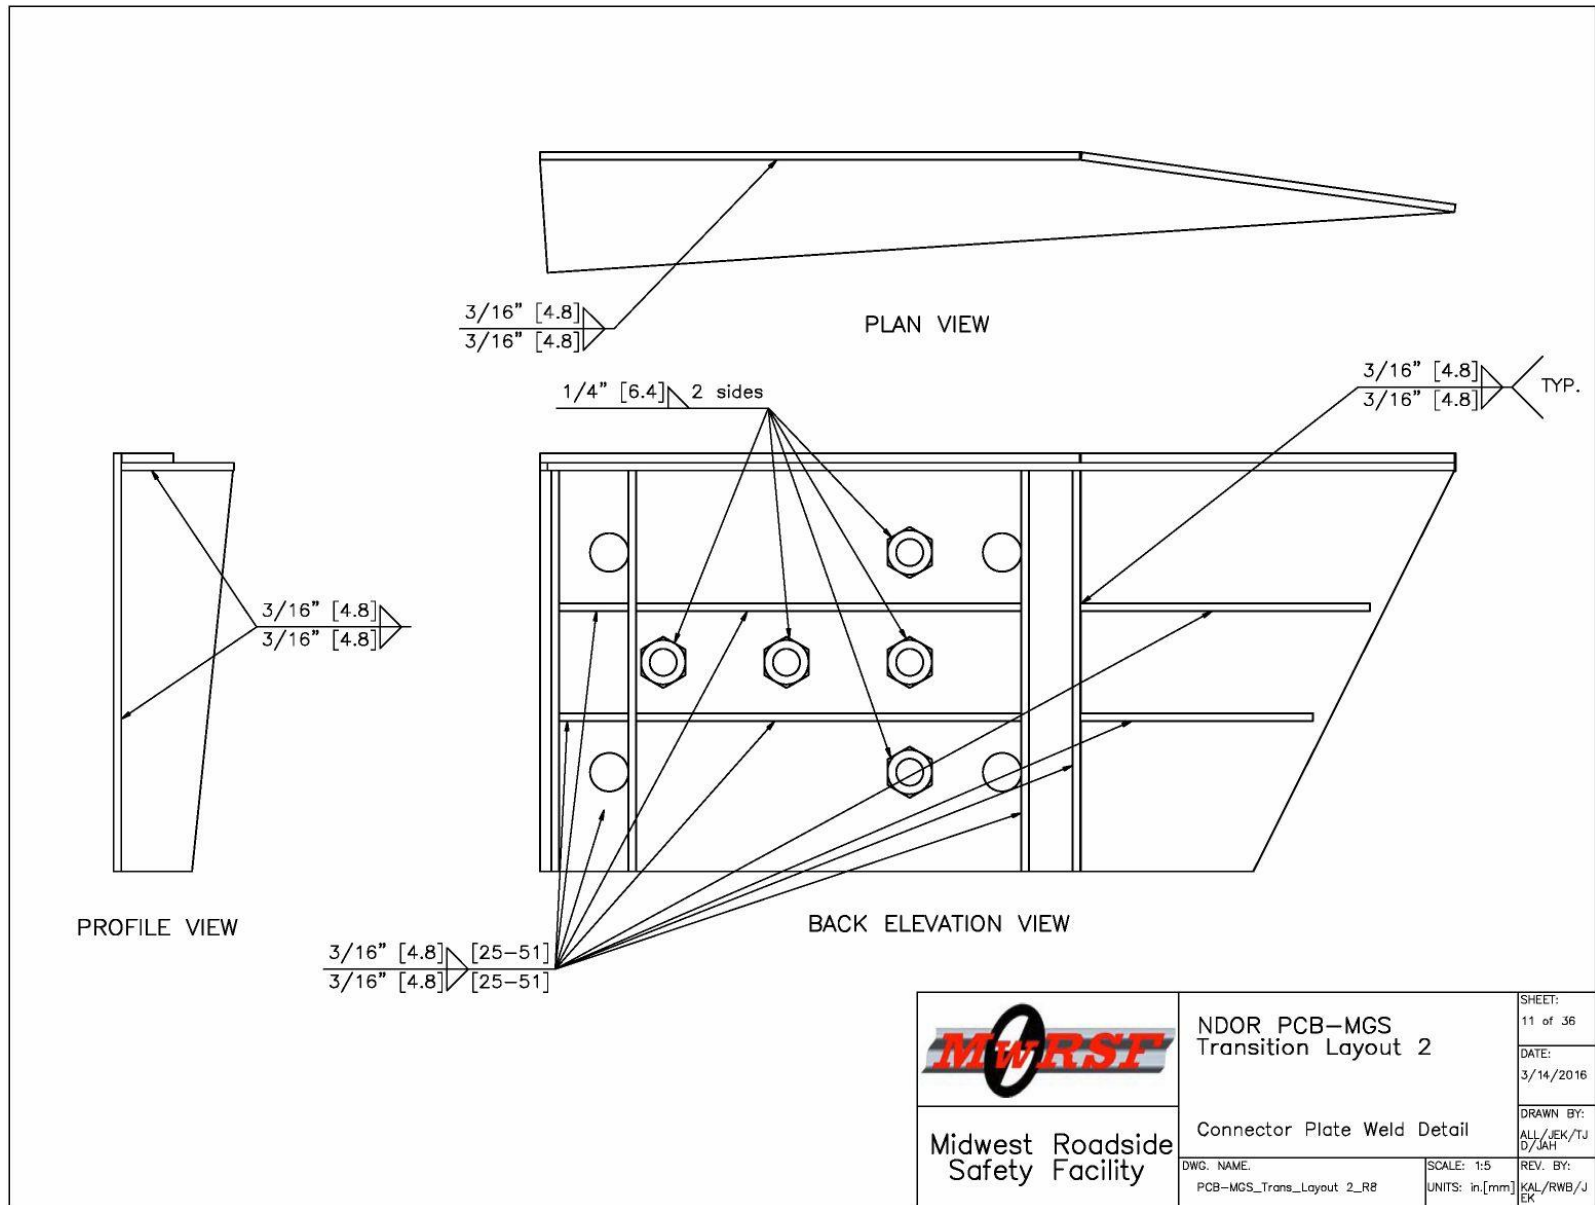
Connector Plate Weld Detail, Test No. MGSPCB-1
